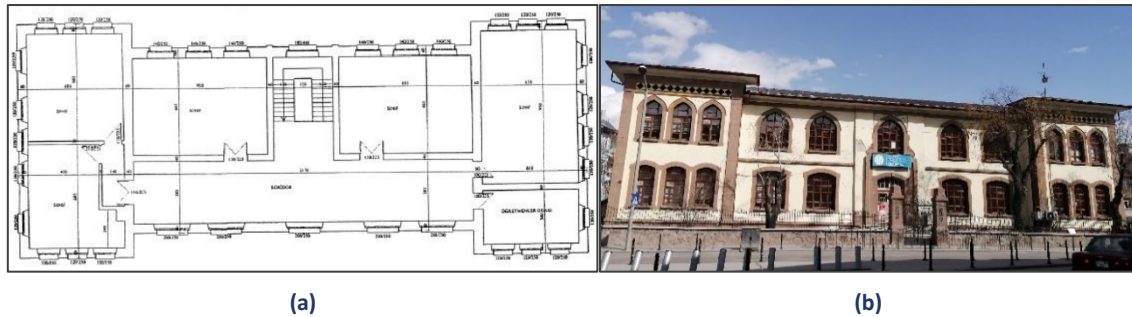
a) İsmet Paşa Primary School ground floor plan (Eroğlu, 2001) b) İsmet Paşa Primary School today (Tuna Sayın, 2021)
